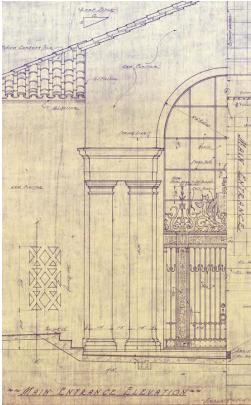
Detail of entry pavilion of Science Building (Woods Hall) Architectural drawing set by G.B. McDougall, 1927
